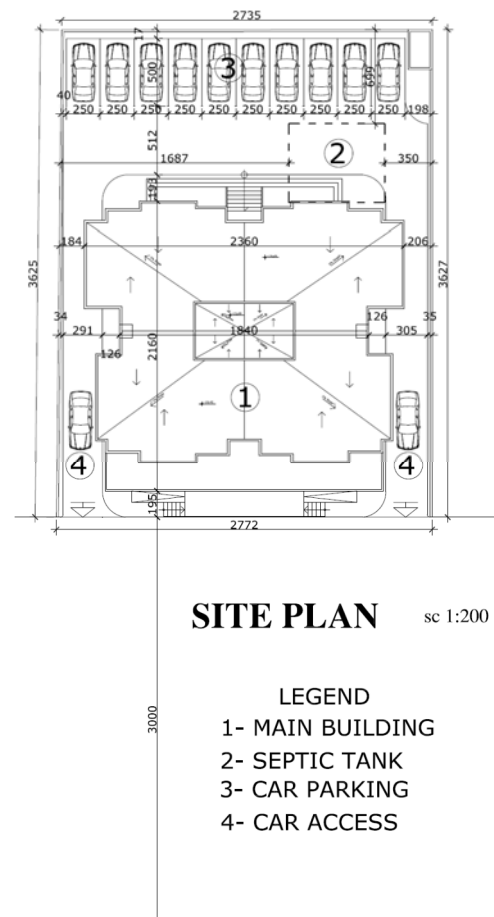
Site plan drawing of *Semay-Tekes* cooperative housing building
